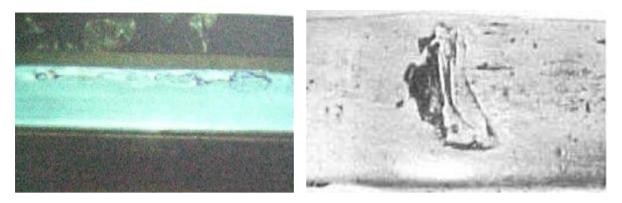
2251 - HEAD, SURFACE, WHEEL BURN ISOLATED
